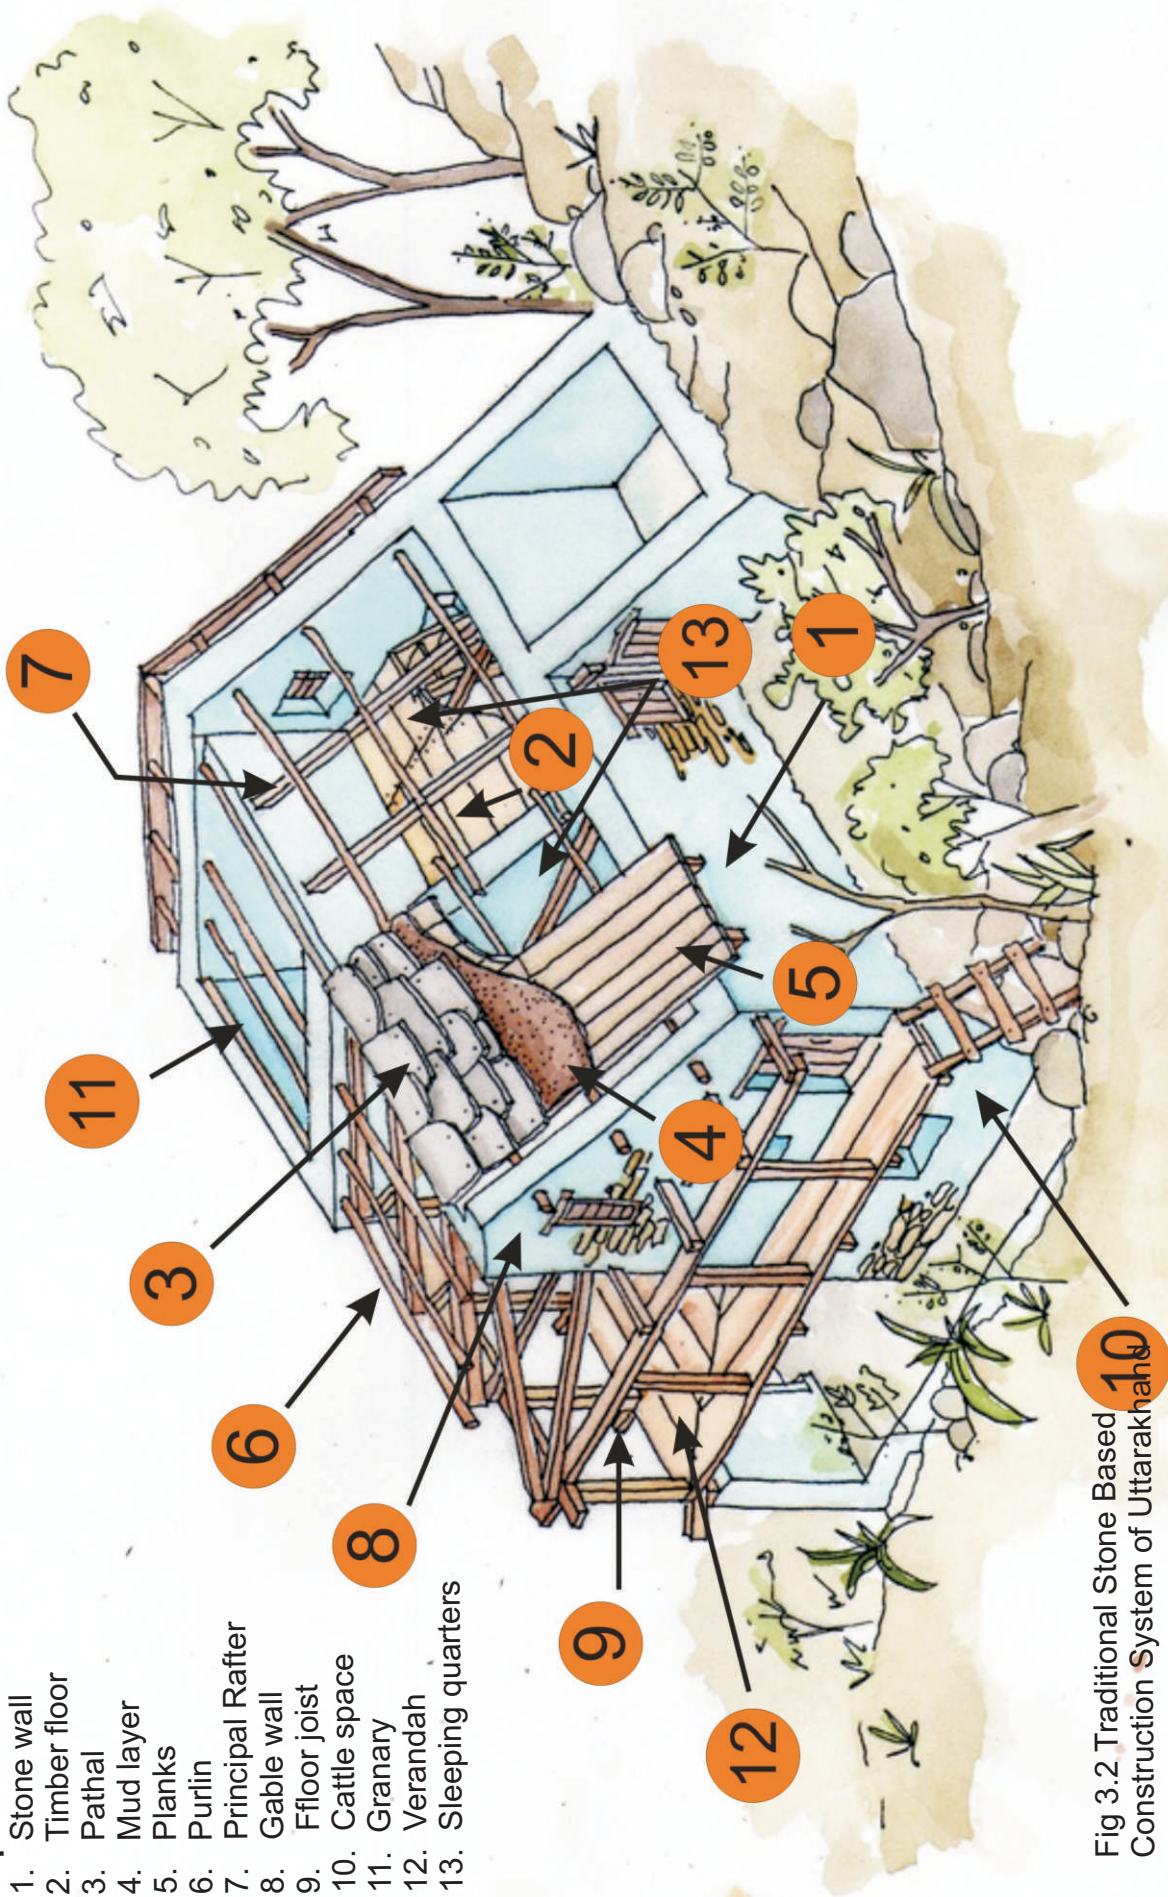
Traditional Stone Based Construction System of Uttarakhand
